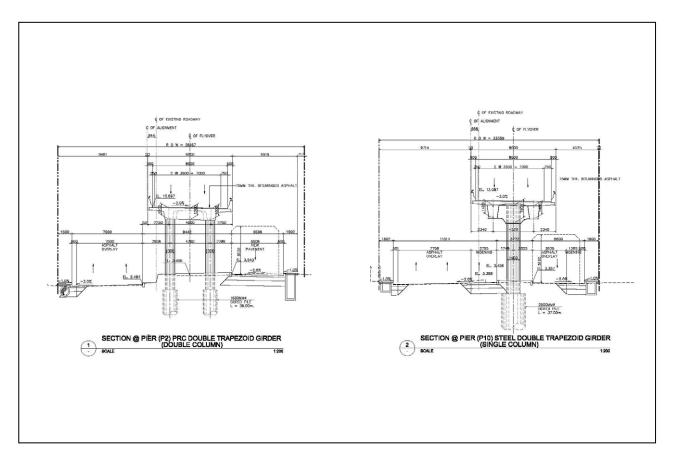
TYPICAL CROSS SECTION (GEBANG)
